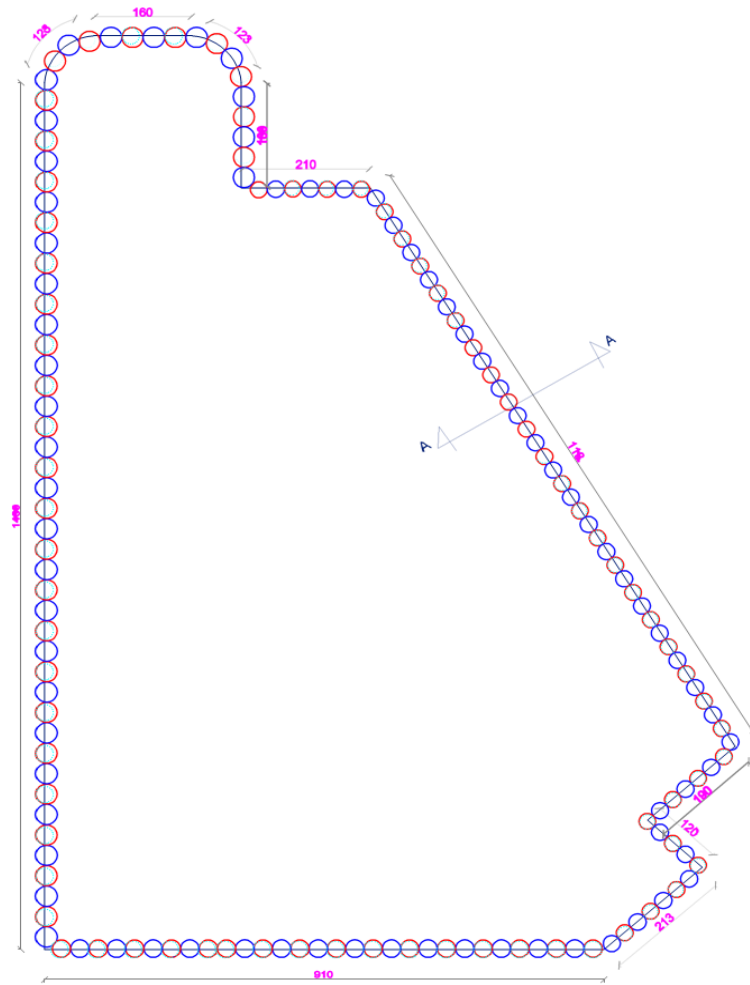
Site layout for the alternative wall scheme for using secant pile wall (All dimensions in cm) [5]
